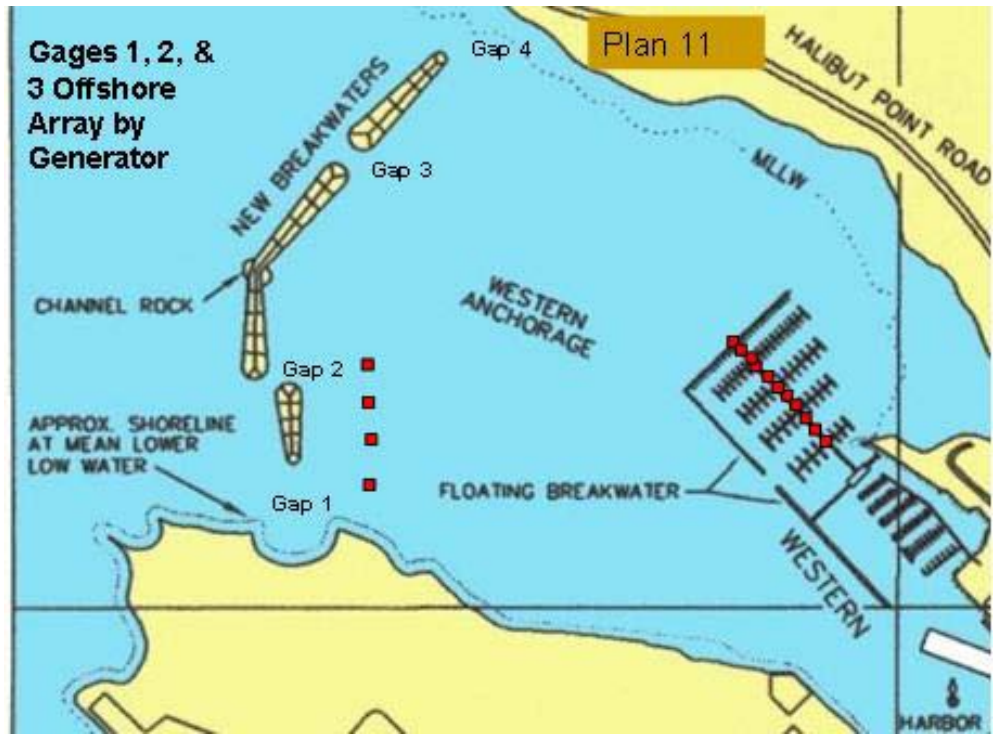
Plan 11 retains the existing configuration for the breakwaters, but uses a starting still water elevation of +7 ft. MLLW.
